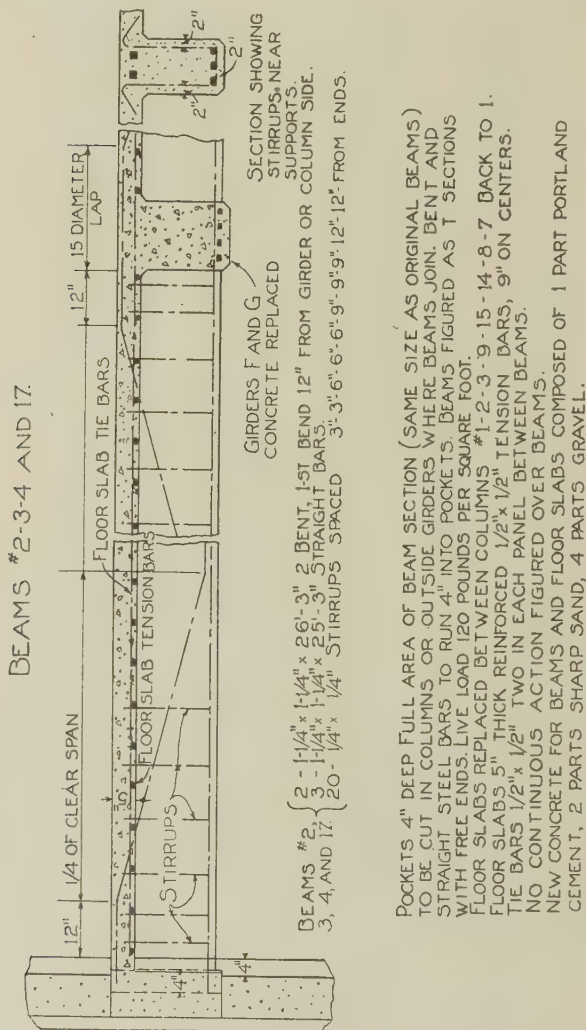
B.—FURTHER DETAILS OF REPAIR METHODS ON FAR ROCKAWAY WAREHOUSE.
